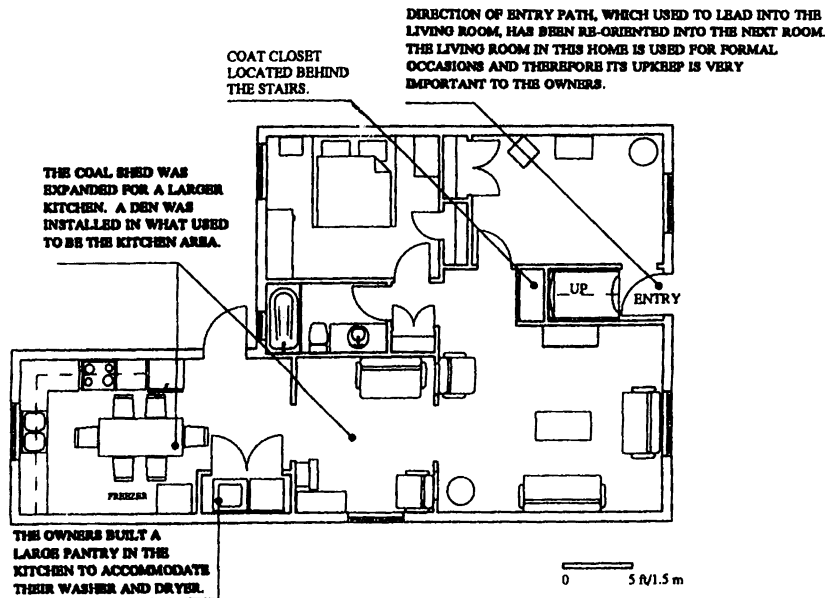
Ground-floor plan of case study 6: expanded kitchen.
